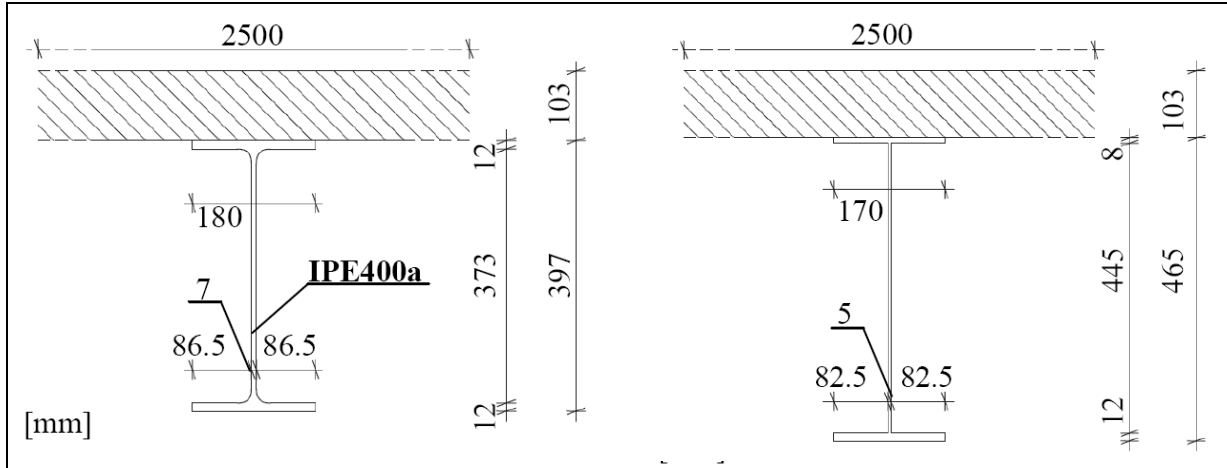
Dimensions of composite beam with IPE400a profile (left) and welded profile (right)
